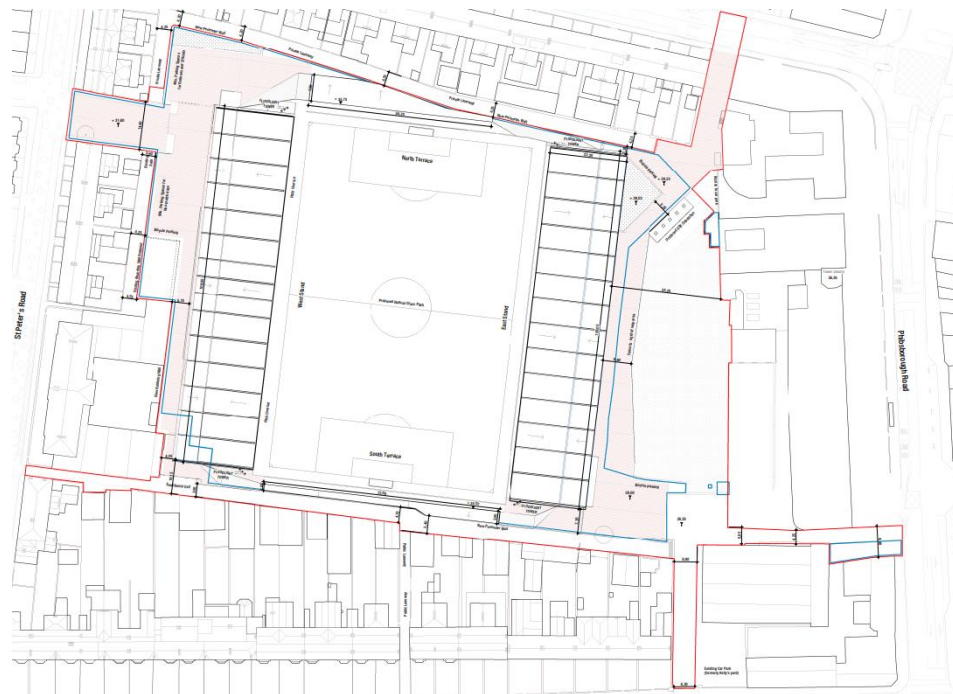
Proposed Site Plan (Source: IDOM & Gilroy McMahon Architects)
